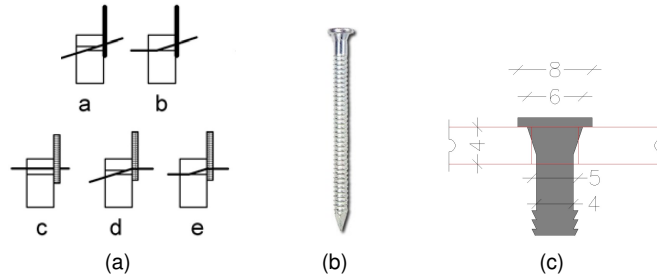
Steel to timber connection - a) failure mode according to the [1] formulation - b) ringed shank nail - c) under-head geometry.
